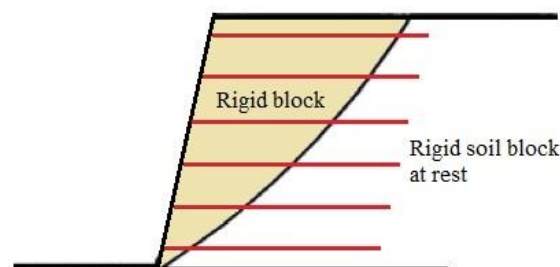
Schematic of the uniform spacing of the wall reinforcement
